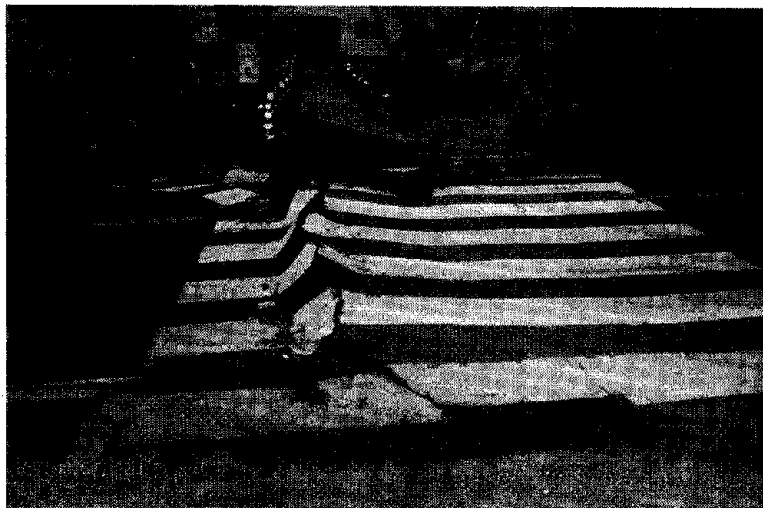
Crash and Uplift of Pavement (National Road 228)
